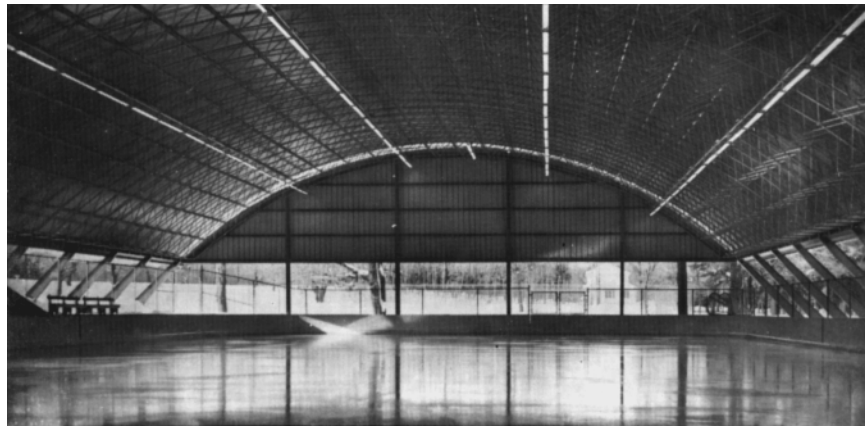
Cold-formed steel joists used together with hot-rolled shapes. (Courtesy of Stran-Steel Corporation.)
